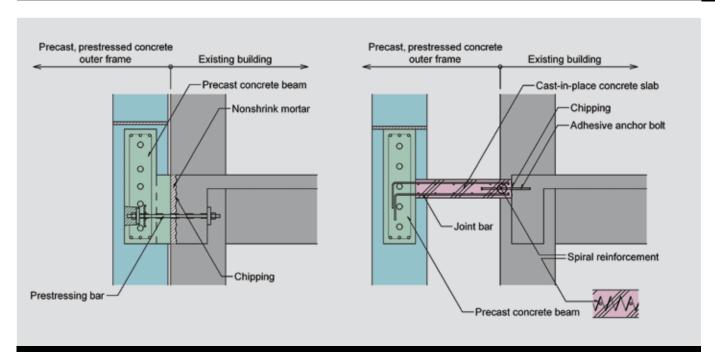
Two methods for shear transfer from the building to the exterior frame. The first is by friction of the prestressing steel bar at the attached connection. The second is by a cast-in-place concrete slab with anchor bolts for the floor slab.
